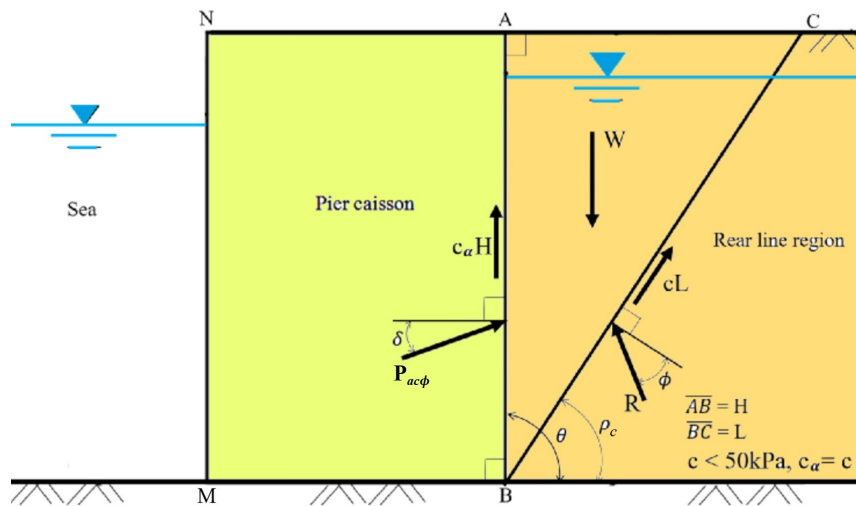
Various forces and the active earth pressure acting on the pier caisson-type retaining wall at Taichung Port, Taiwan, along with the wedge failure block in the region behind the wall.
